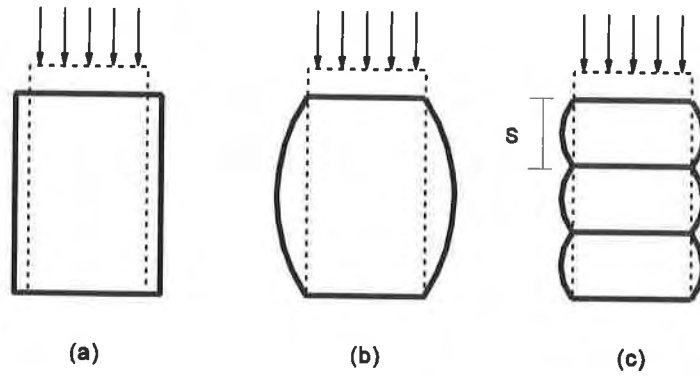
Deformed specimen shapes under axial loading: (a) ideal, (b) unreinforced, and (c) reinforced.
